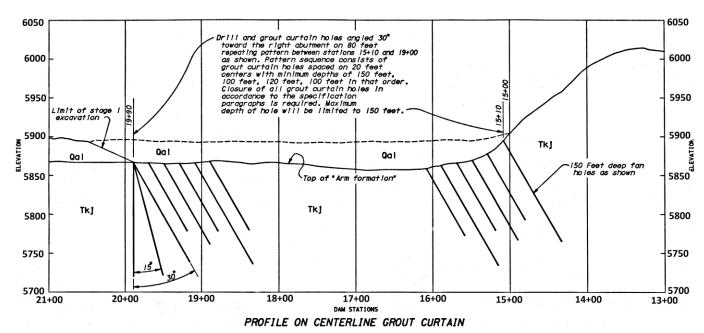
Section view of original grout curtain design at Jordanelle Dam – Stage 1
